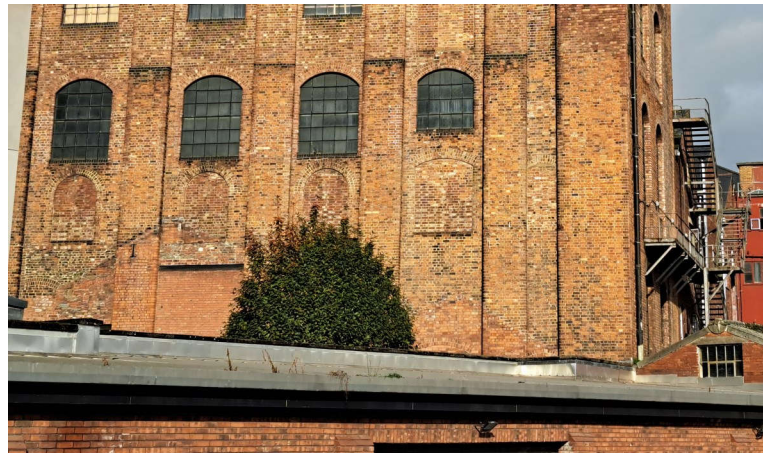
Detail view of eastern end of southern elevation of Building 1. Shows roof scars, blocked windows and variation in brickwork. No scale.
